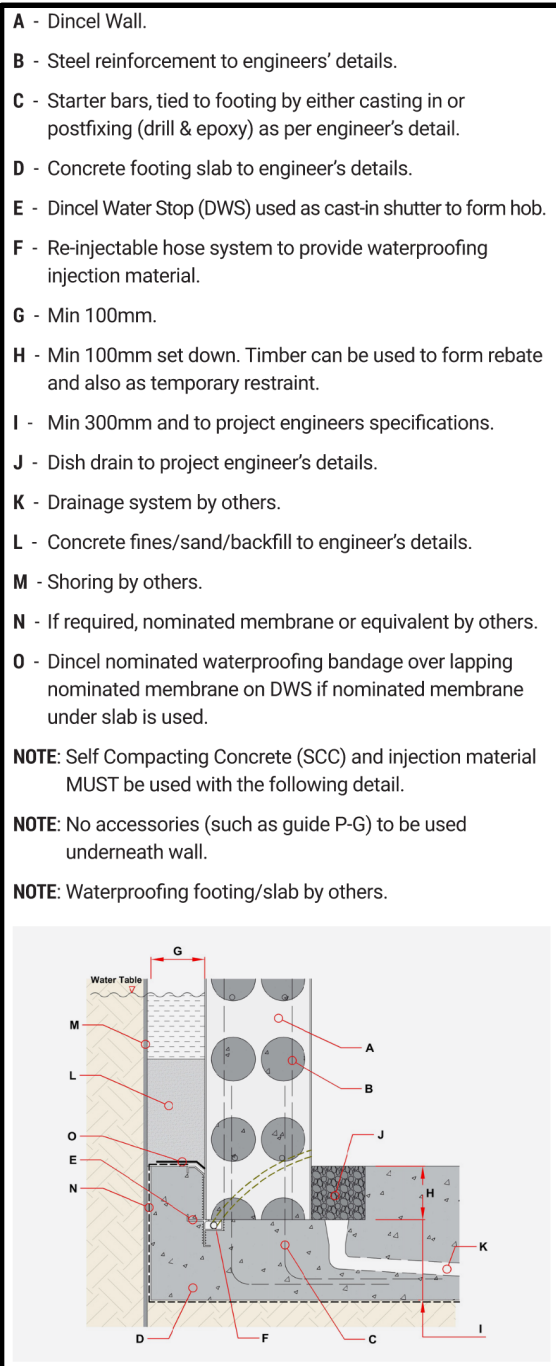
Slab to wall joint treatment (image extracted from Dintel literature)
